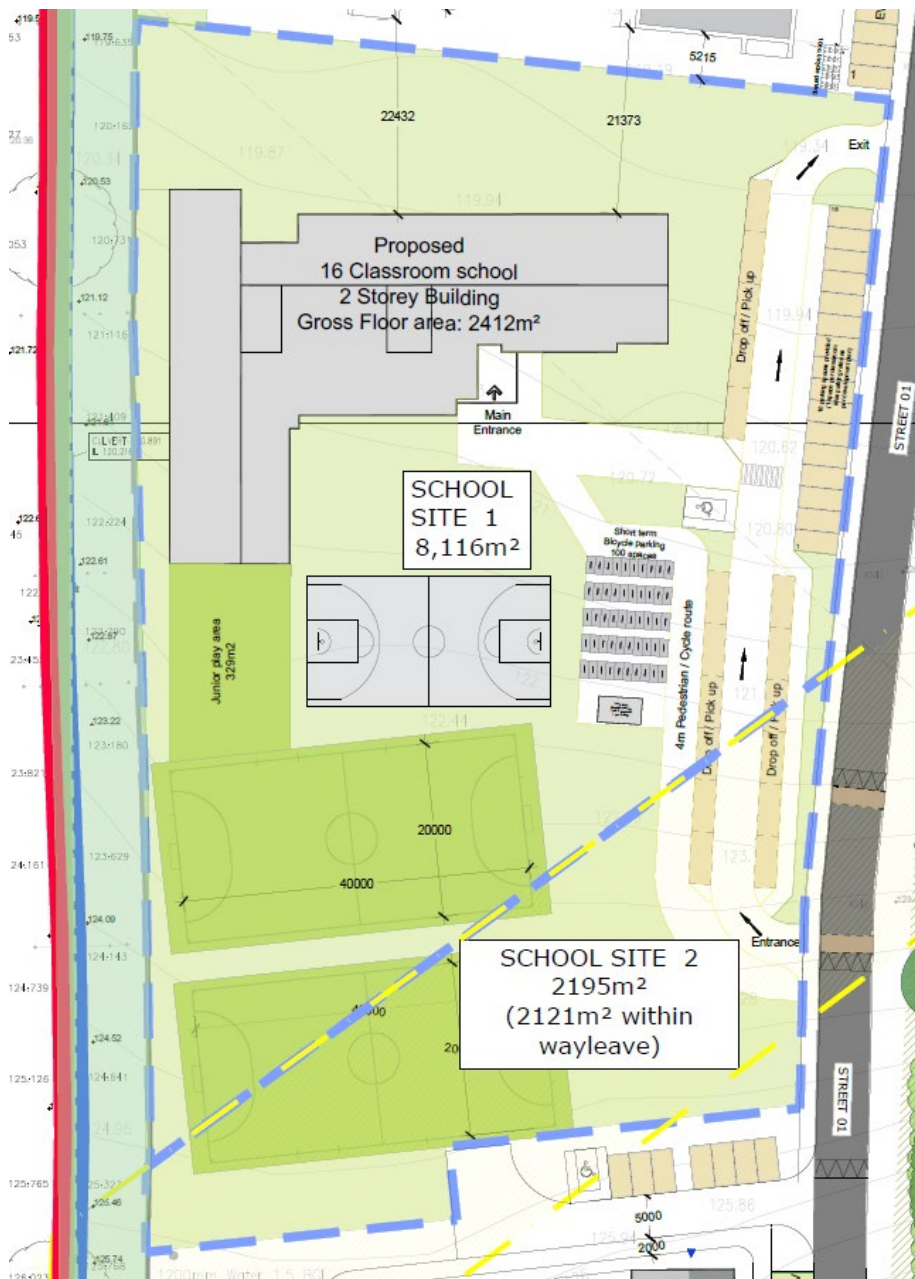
Indicative site layout plan for school site illustrating the accommodation of a 16 classroom primary school on same
